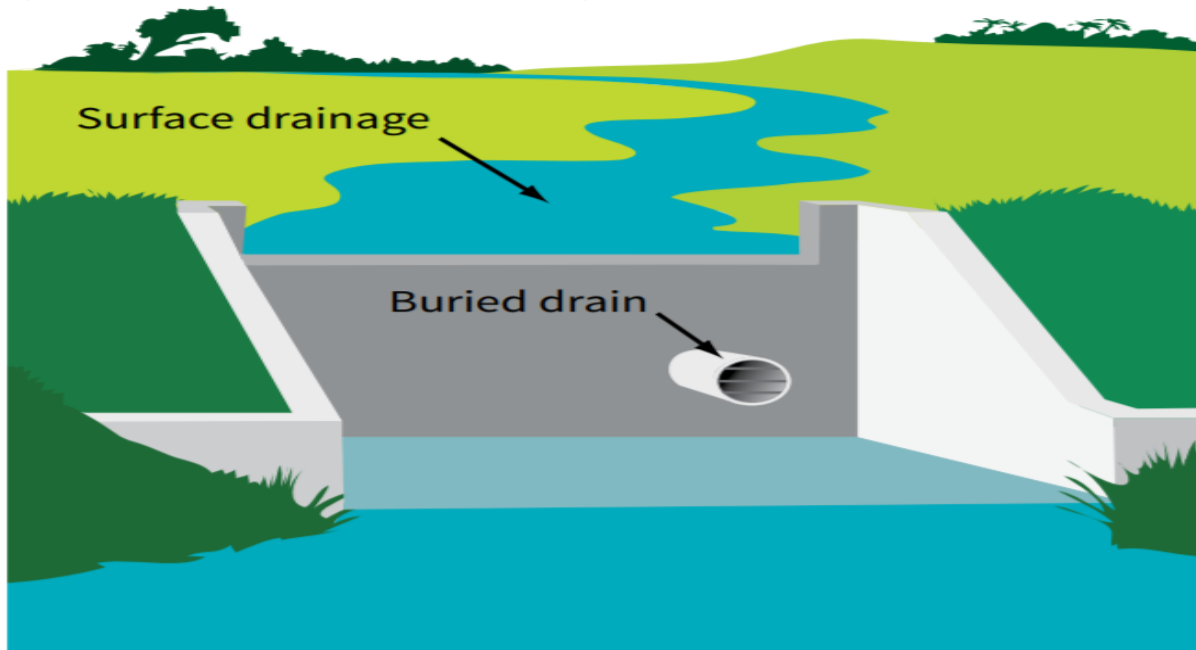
Subsoil (buried conduit) drain constructed from ceramic tile pipes.<sup>3</sup>
